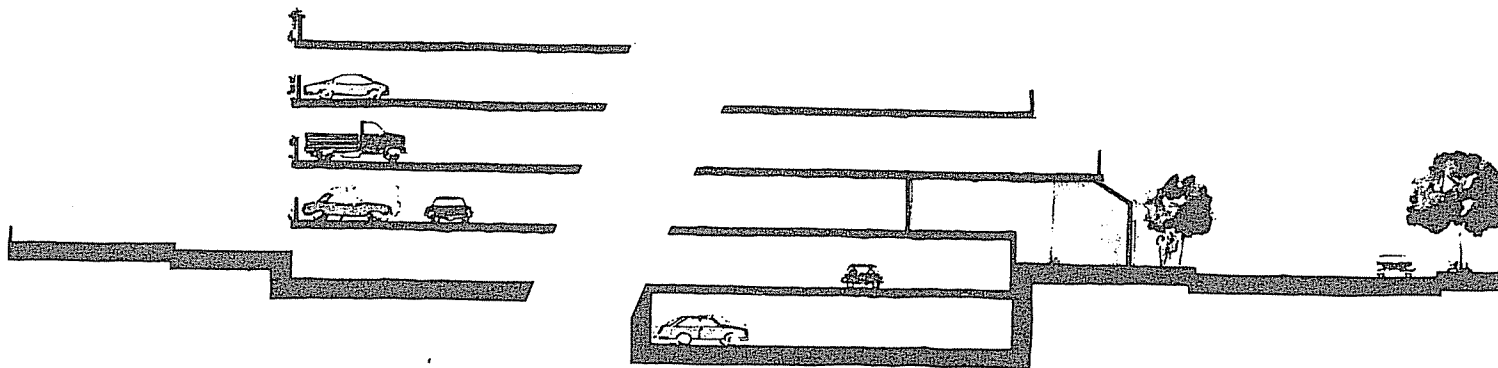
Conceptual transverse cross-section of east-west, half-block parking structure showing loft retail area
